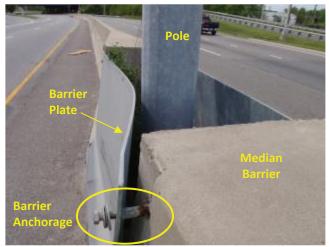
Damaged median barrier plate with failed/pulled out barrier anchorage (Luminaire structure shown for illustrative purposes only)
